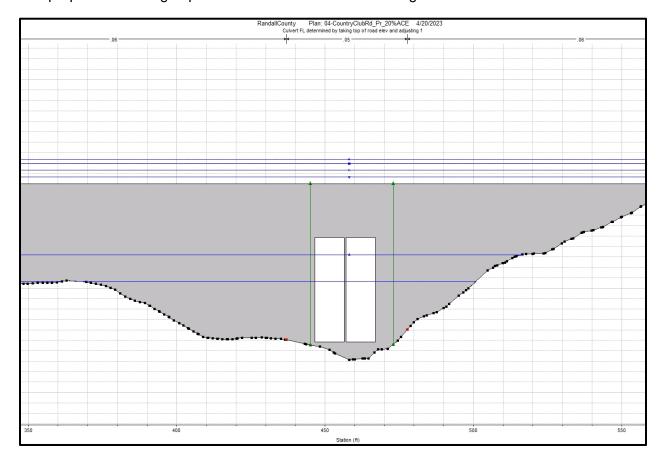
Proposed 20% LOS upstream cross section at Country Club Road crossing of unnamed stream east of IH-27.
